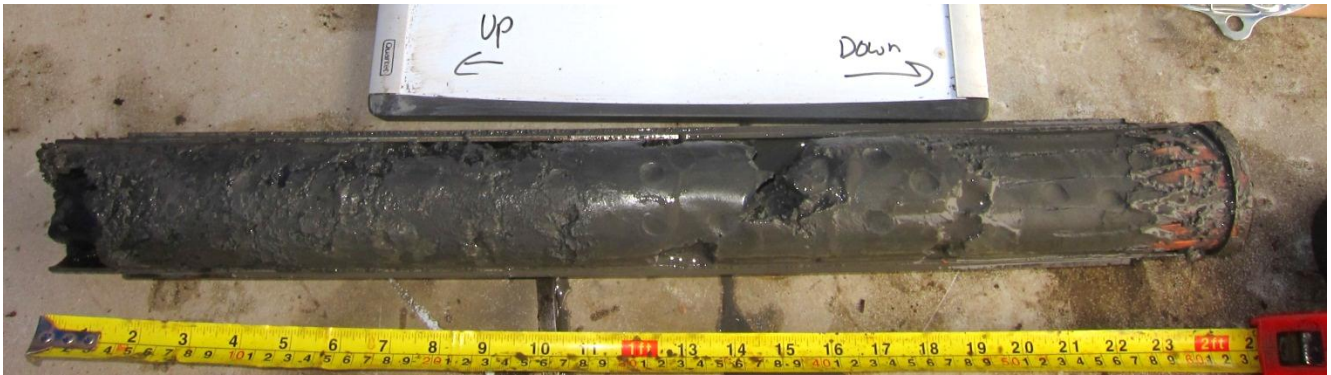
KC12-OVB49 LPT 10 of 13 (17.02 m – 17.62 m)
